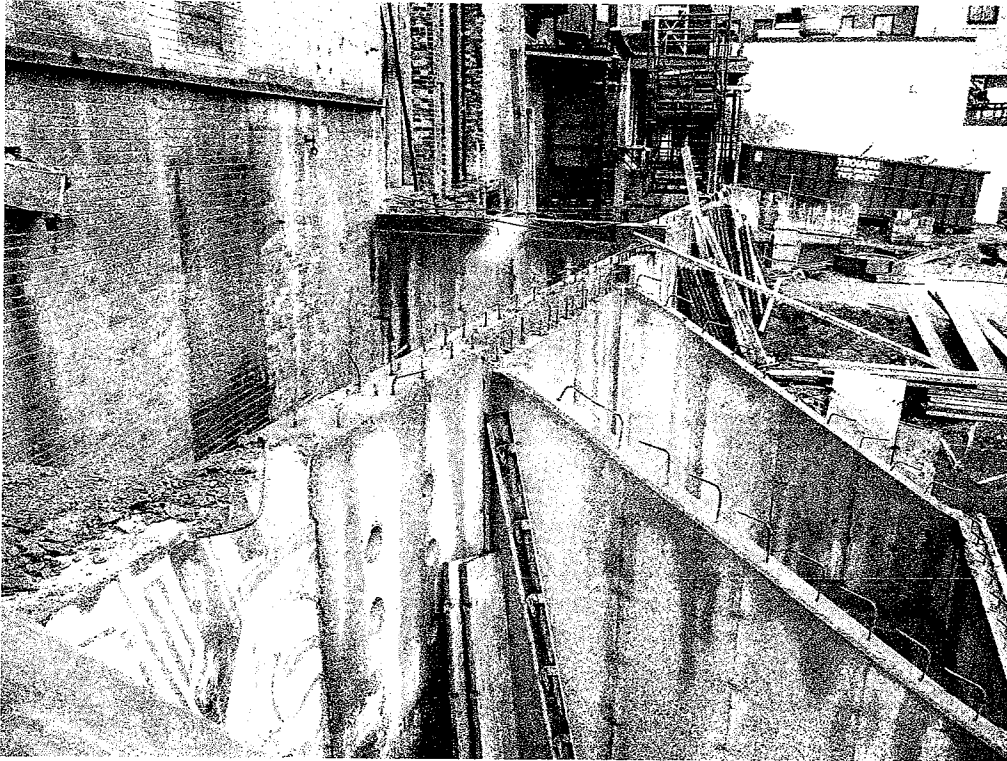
Back entrance foundation wall. Note sleeves in wall adjacent to stairs.
